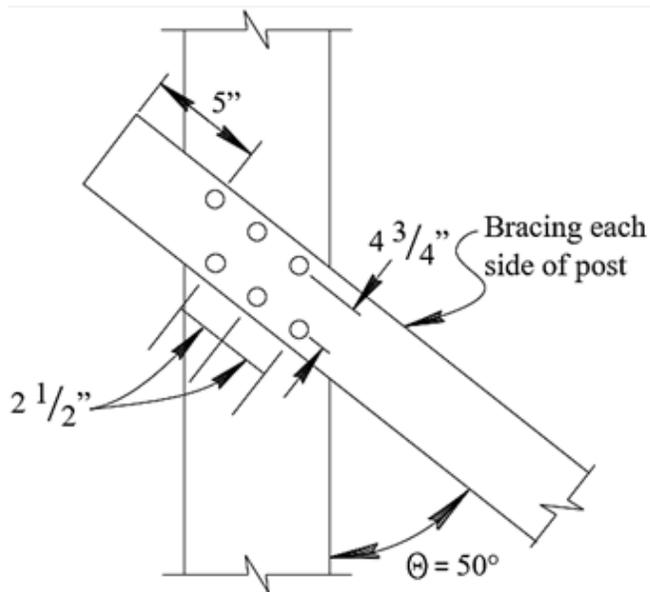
Post and Double Brace with Multiple Fasteners
